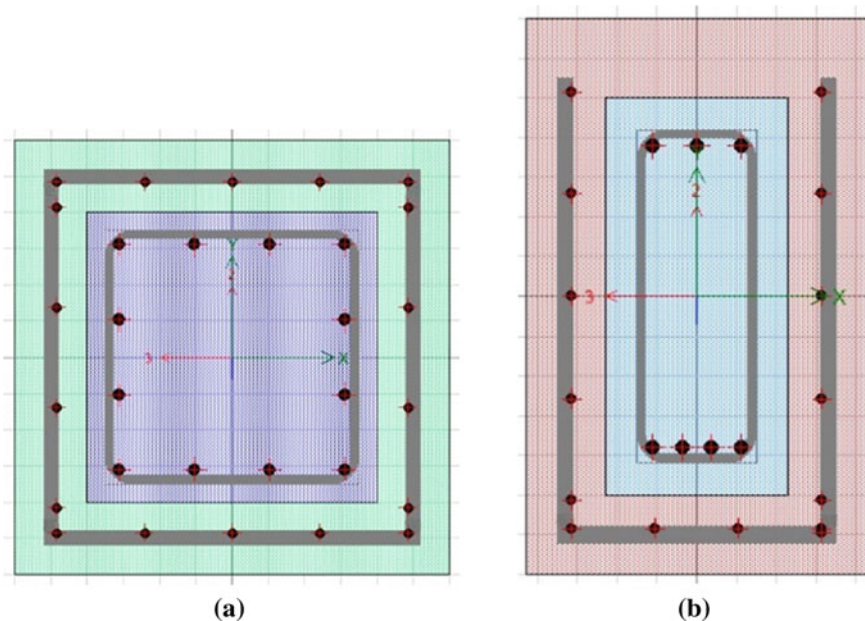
Typical cross-sections of a Retrofitted column, b Retrofitted beam
